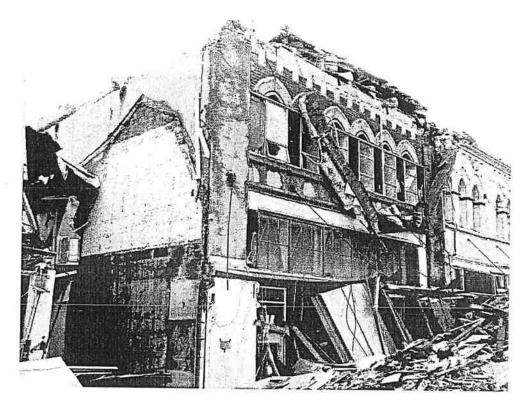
Southwest corner of building show loss of 3rd floor, façade glazing and canopy.
